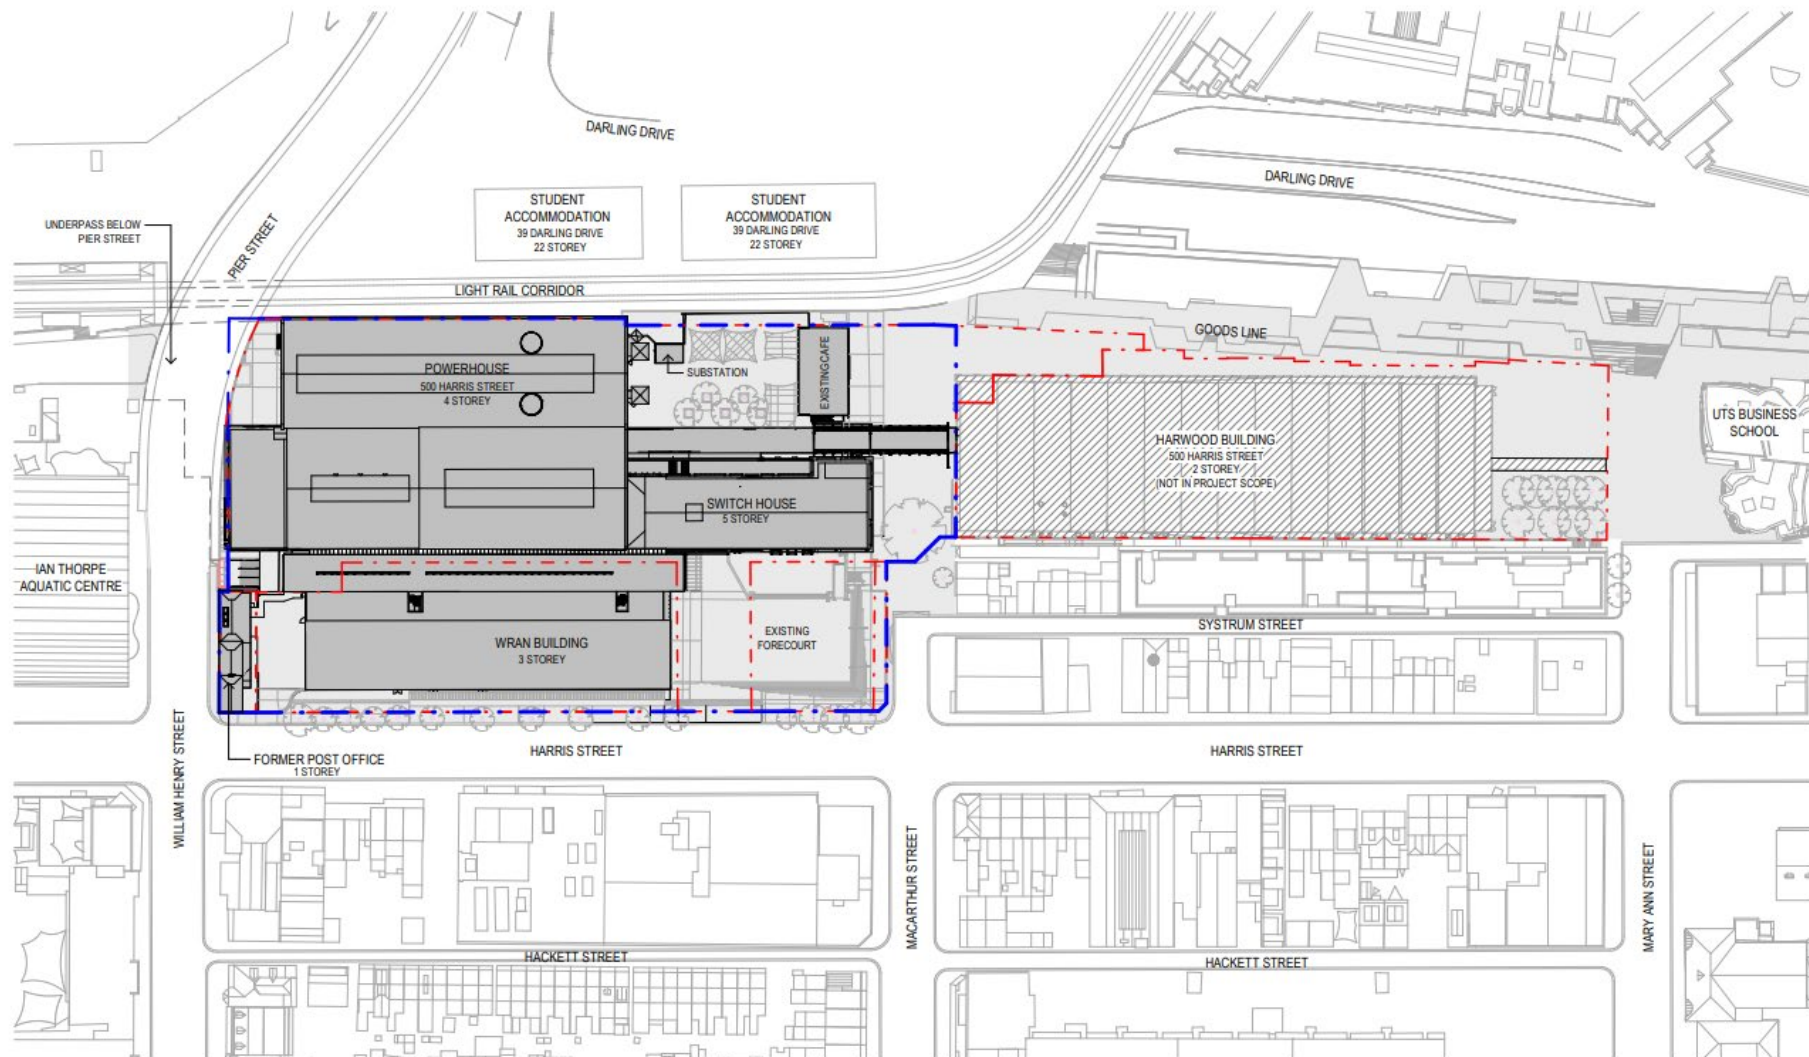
Ultimo Powerhouse- Building Envelope Existing Site Plan (Source: John Wardle Architects, 17 May 2022)
